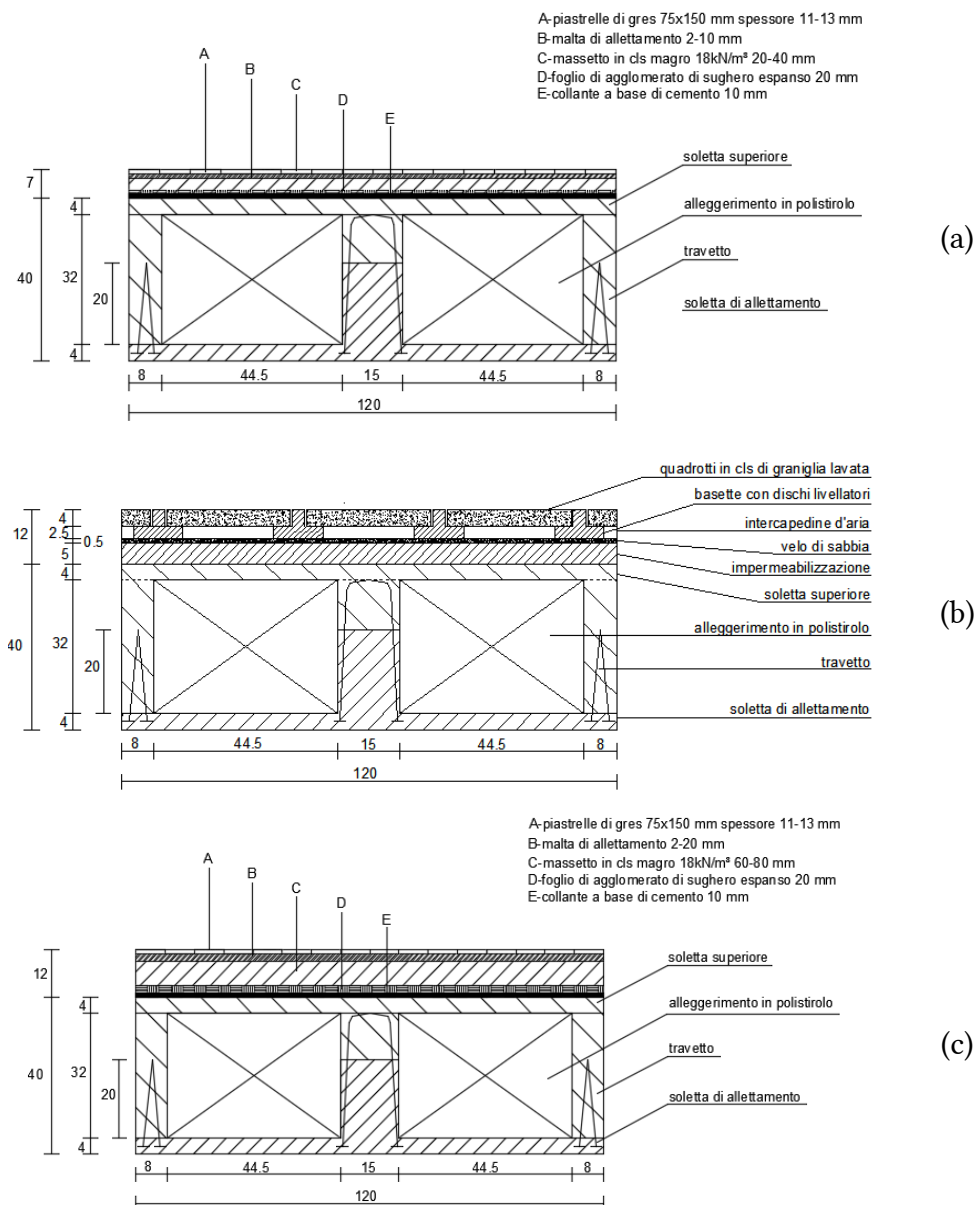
(a) Lowered intermediate floor; (b) roof floor (c); normal intermediate floor.
